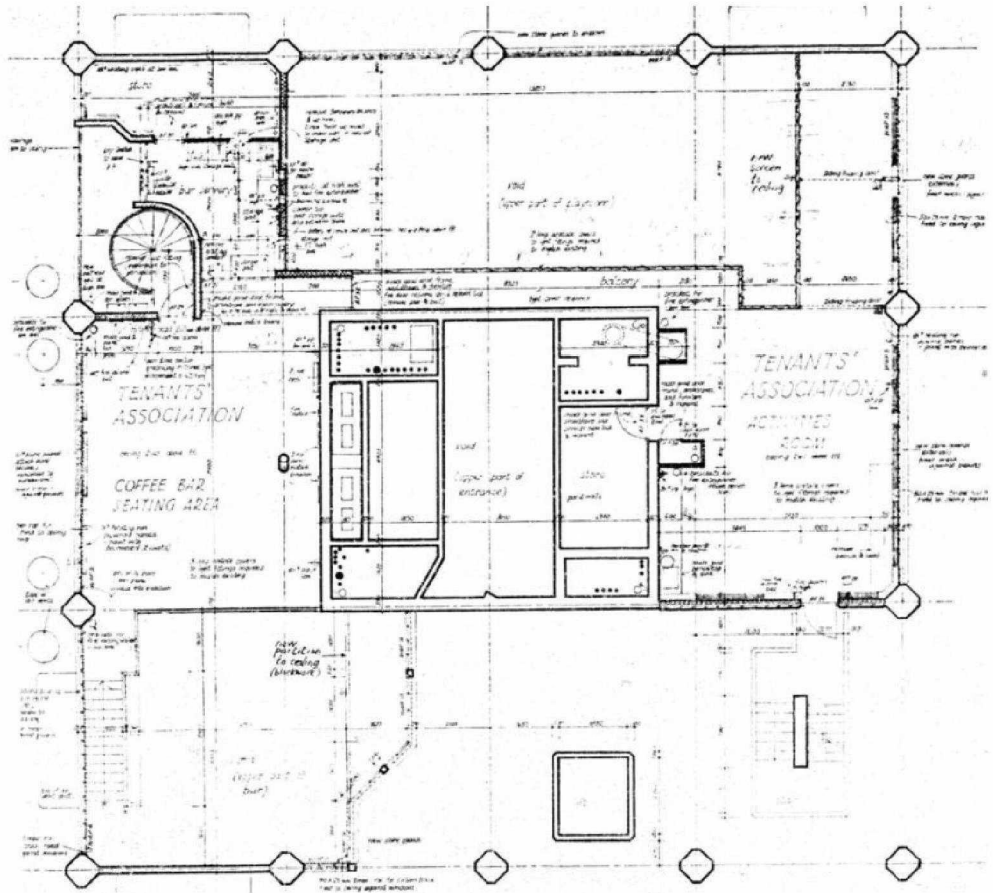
Original level 1 floor plan. (RBK00018862)
